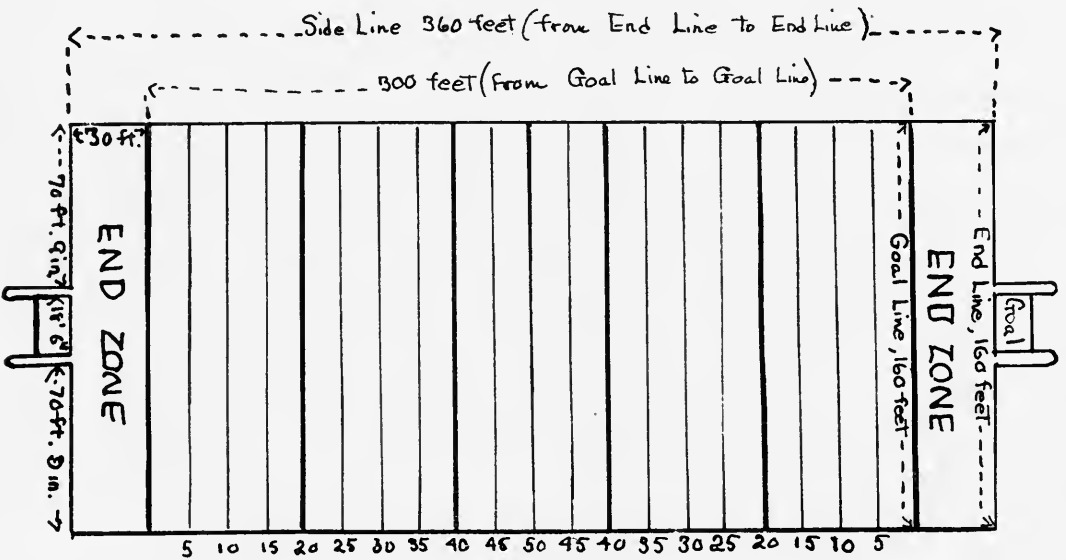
DIAGRAM FOR LAYING OUT FOOTBALL FIELD
